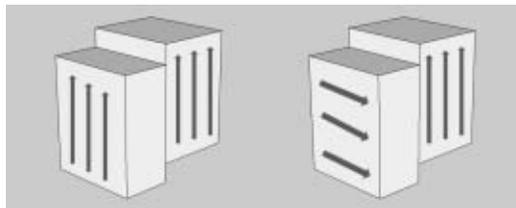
TSchematics of Specimen (Parallel laminating - left, Cross laminating - right).
